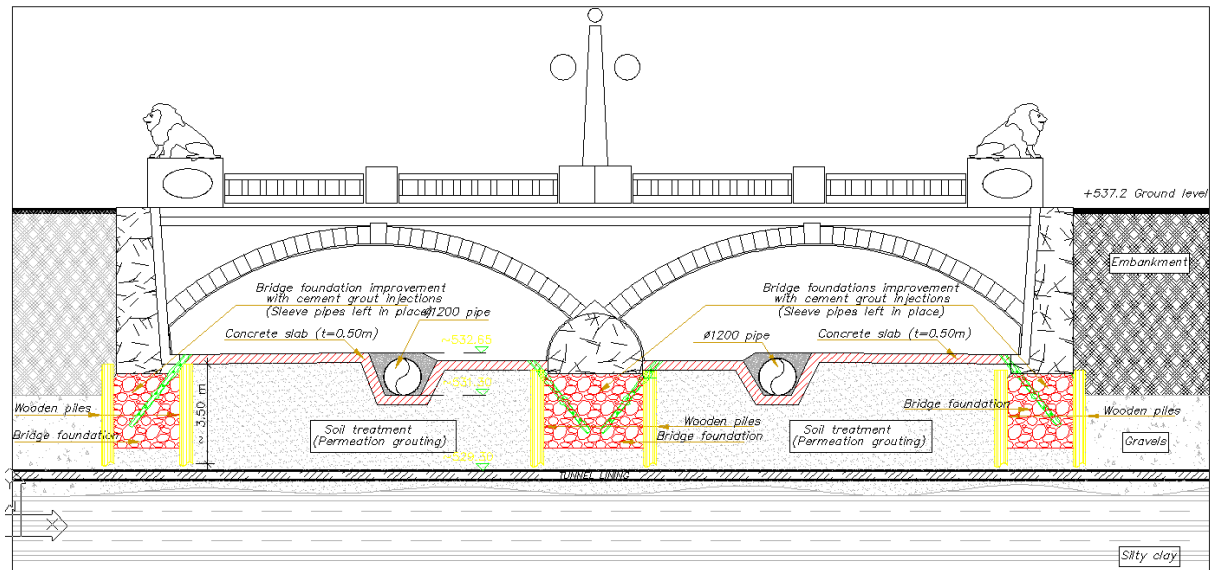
Ground treatment scheme of the Lions Bridge foundations.
